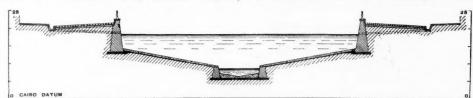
A Section of the Main Canal-New Orleans Drainage System
